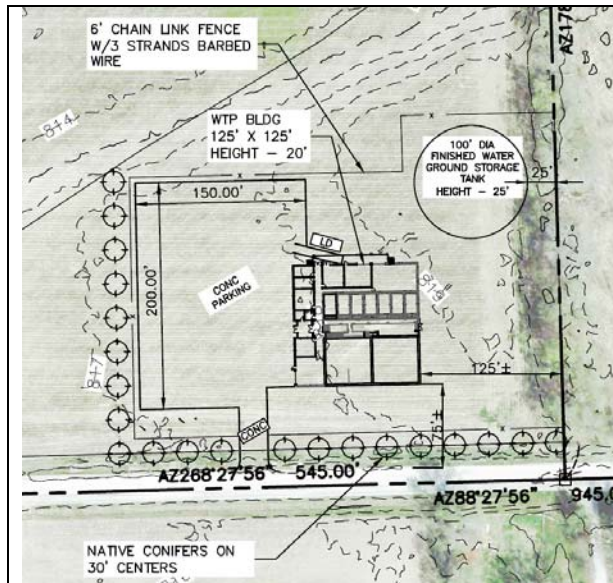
Landscaping proposed to screen the facility from N 1500 Road.
